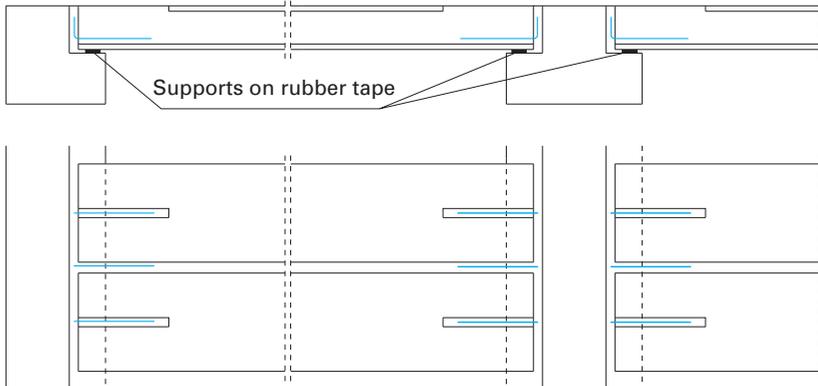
Hollow core floor with simple support on inverted T and L beams.
